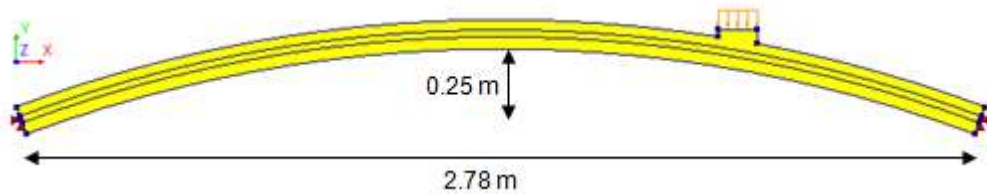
Load application and supports in the 2D shell model. The reinforcement can also be observed
